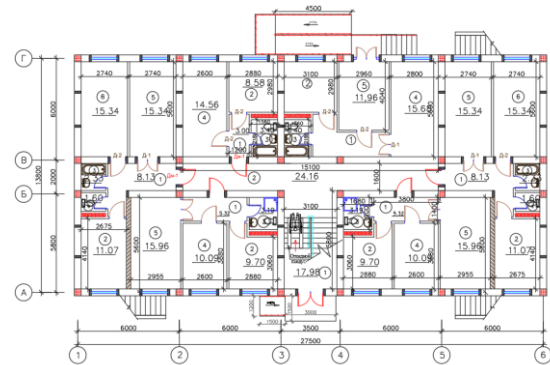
Floor plan of a 4-story residential building with planned dimensions of 27.5×13.8 m
